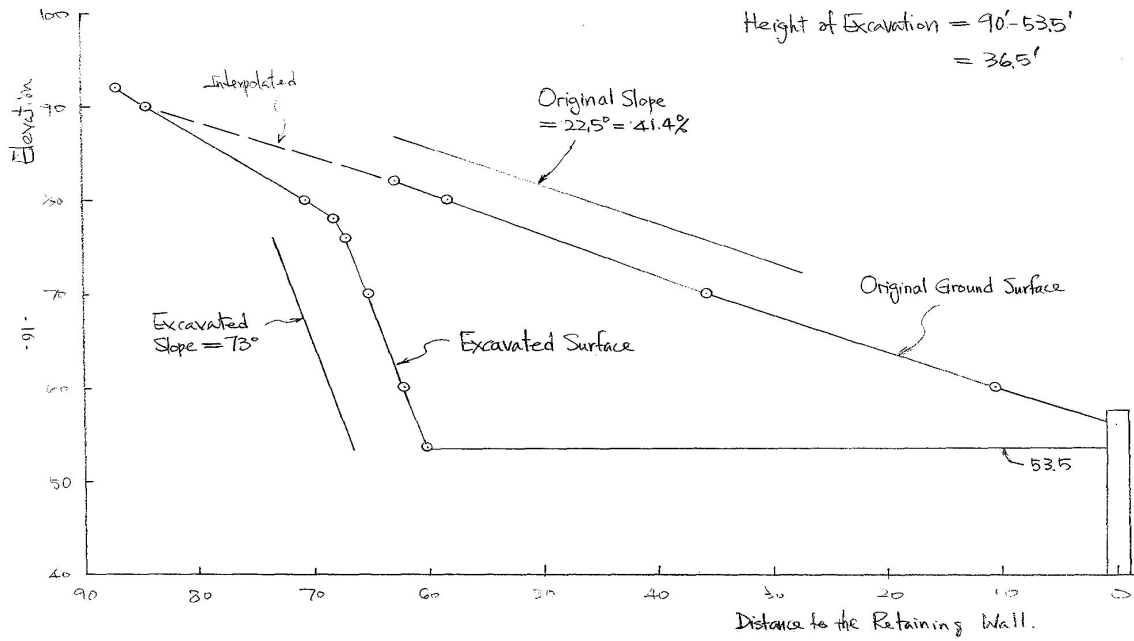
Cross Section of the Original Ground Surface and the Excavated Surface, North of the Collapsed Area (73 feet from the North End of the Retaining Wall).
